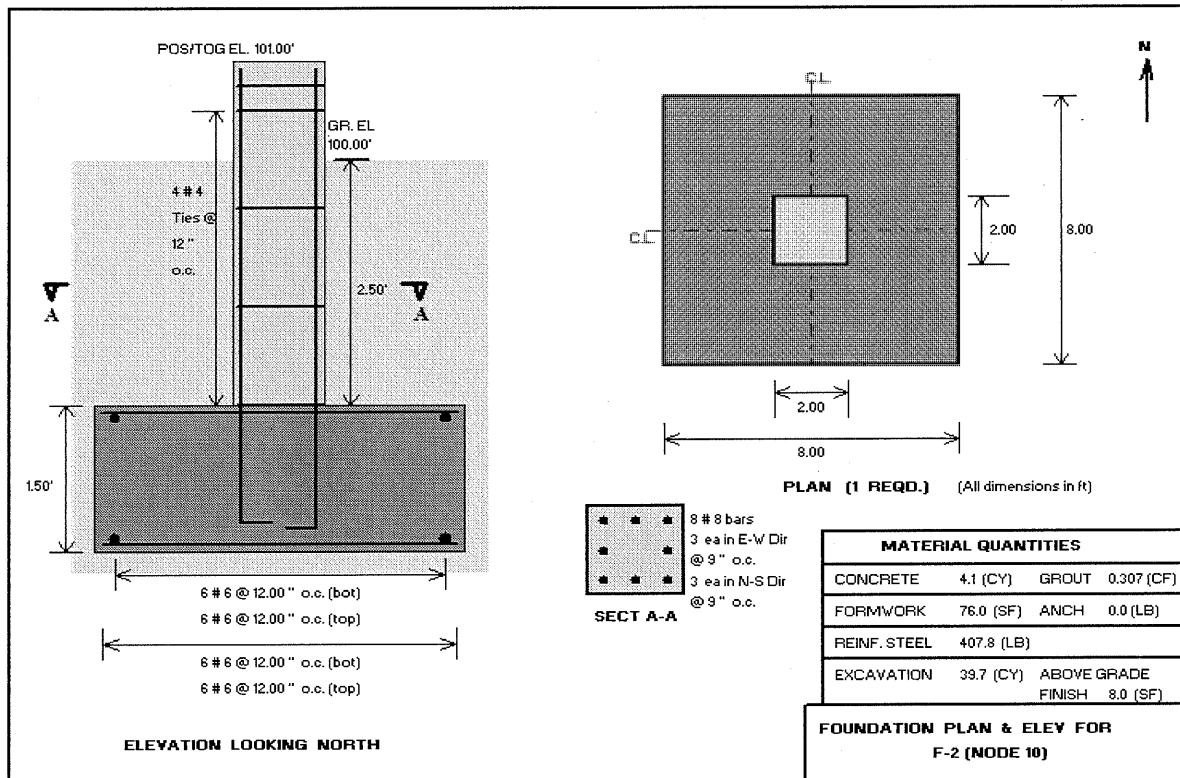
DETAIL REPORT FOR F-2 (node 10)PIER/BASE PLATE DESIGN INFORMATION
